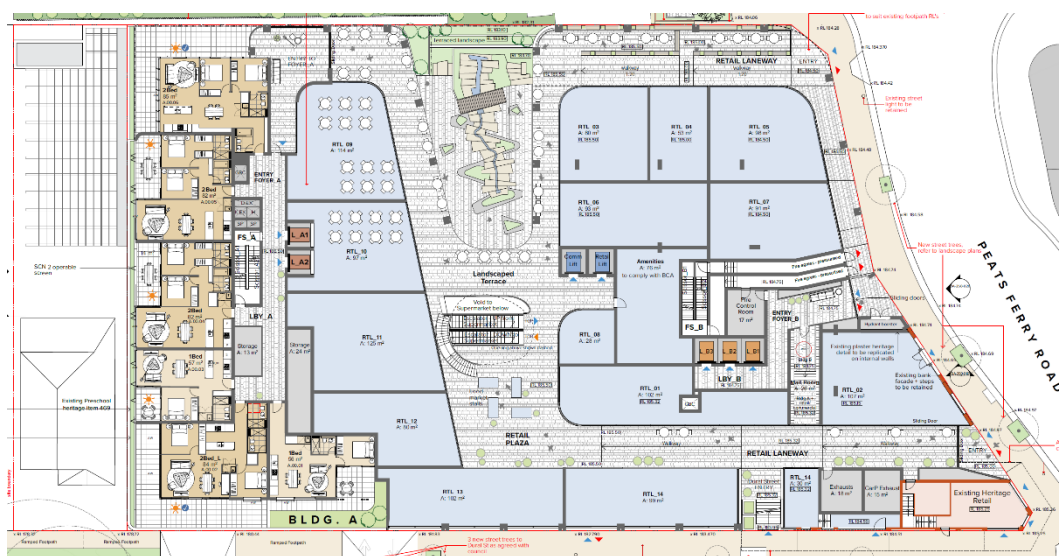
Extract of the Ground Floor plan (Source: Turner Architects)
